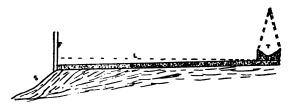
CEMENT FEEDING FLOOR FOR HOGHOUSE.
